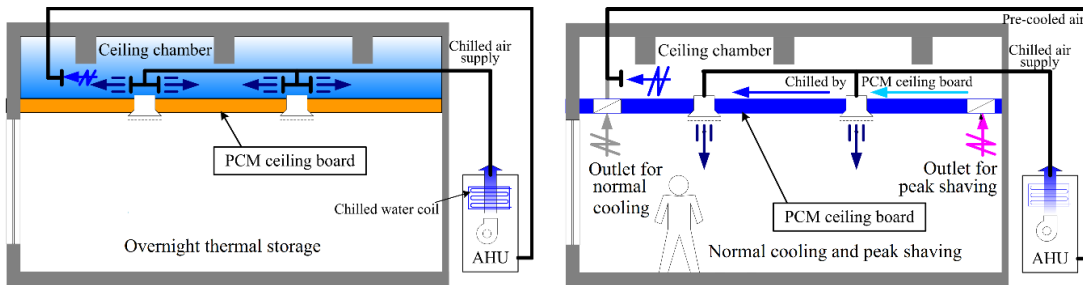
The air conditioning system enhanced by PCM ceiling wallboard (Kondo and Ibamoto 2006).
